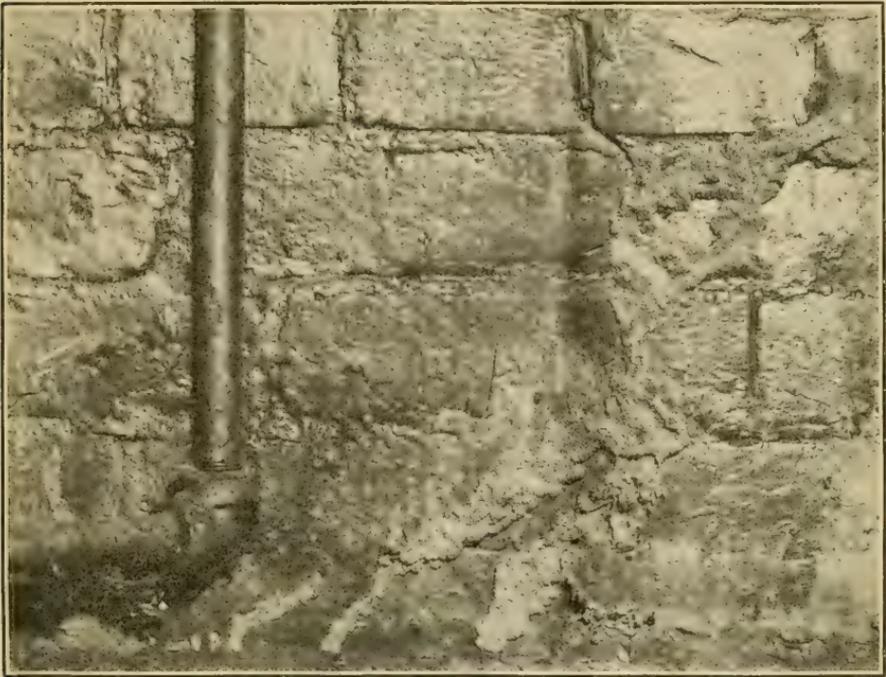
Earthlike shelter tubes of the white ant *Leucotermes flavipes*, constructed of earth mixed with finely digested, excreted wood, and built over brick wall in heated, dark, damp basement. These tubes extend through cracks between the basement pine flooring and the wall near a steam radiator. Note the granular structure. The insects use these tubes in passing over impenetrable substances and to protect them from the light in extending their galleries—in this case up to the next floor in an old building in Washington, D. C. (Original.)
